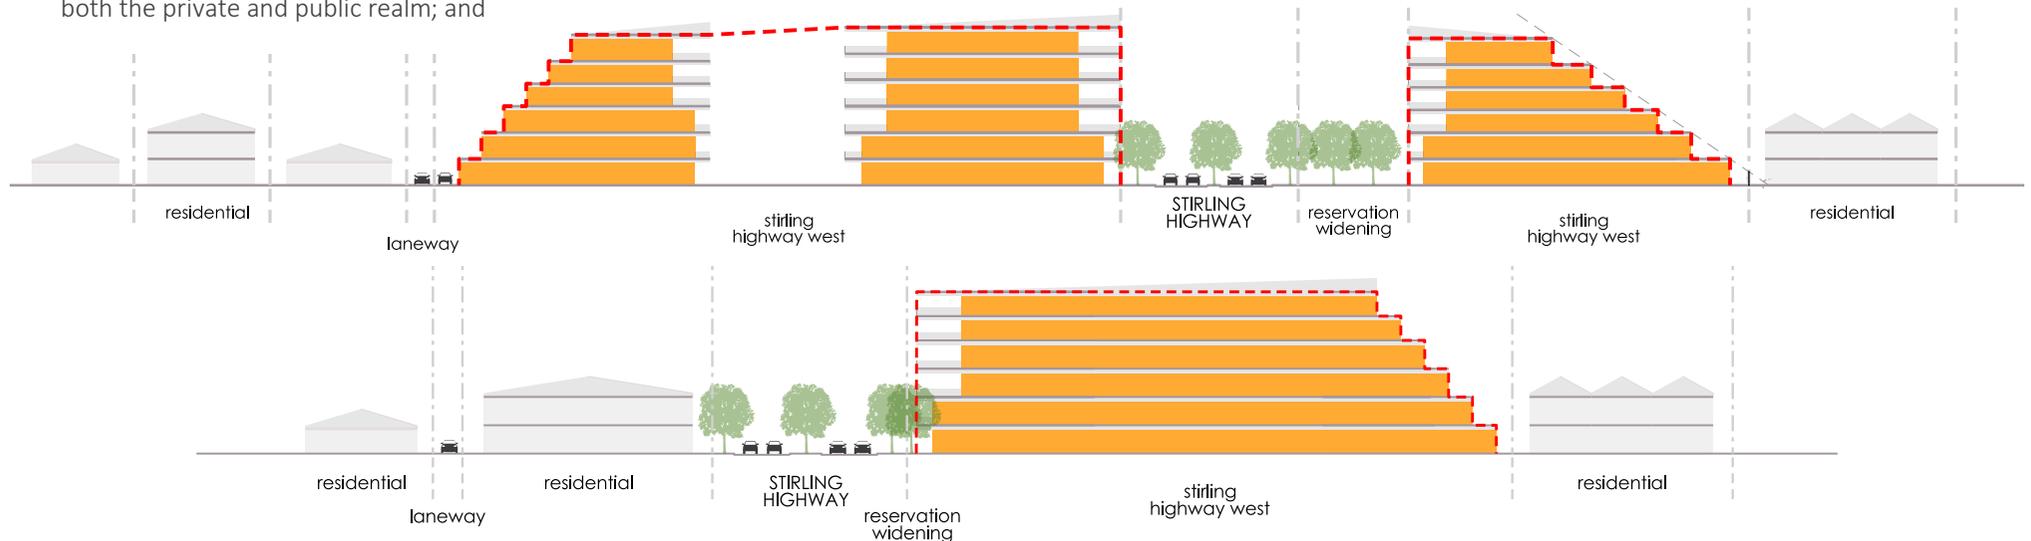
Cross Section A-A and B-B shown spatially on Figure 15, outlining the potential built form envelopes for new development within the Stirling Highway West Urban Corridor Planning Area.
